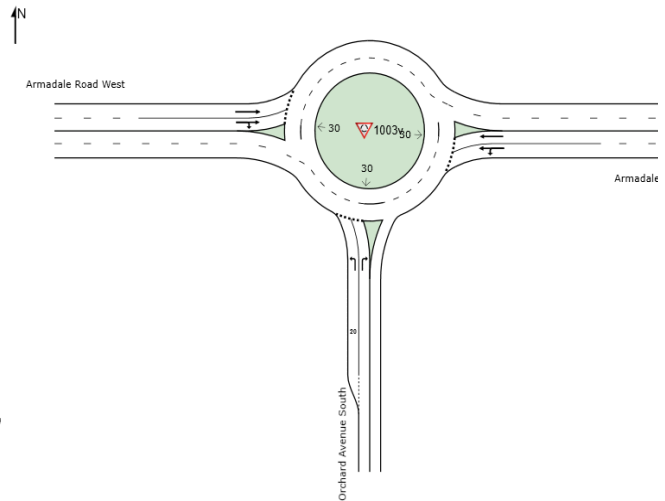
Armadale Road/ Orchard Avenue – Roundabout option
